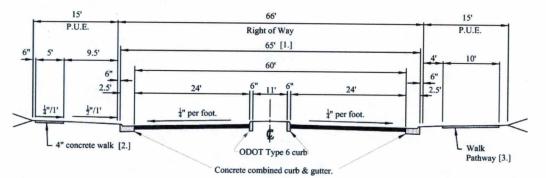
Typical Section, Primary and Secondary Arterial - Urban
